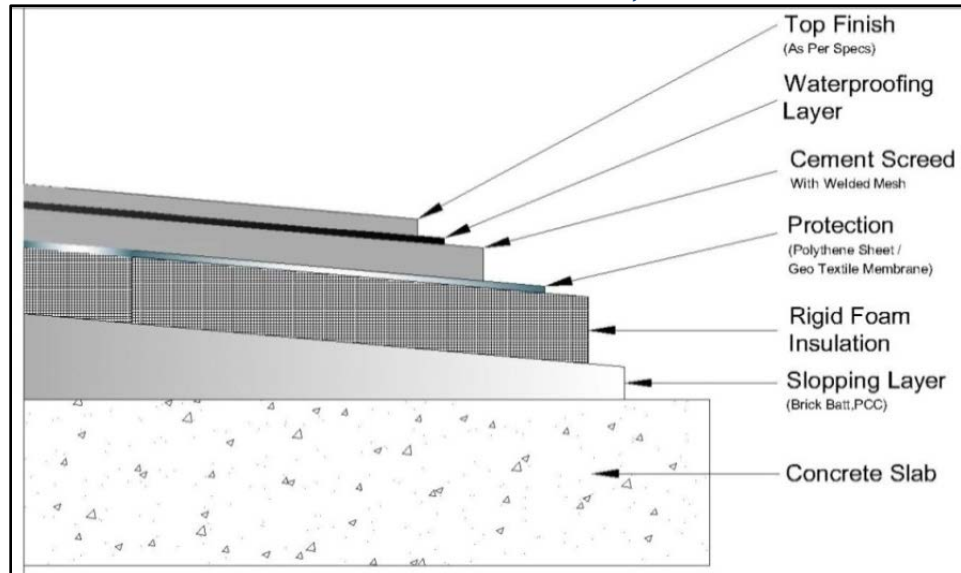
ROOF OVER DECK THERMAL INSULATION SYSTEM, WATERPROOFING LAYER ABOVE INSULATION
